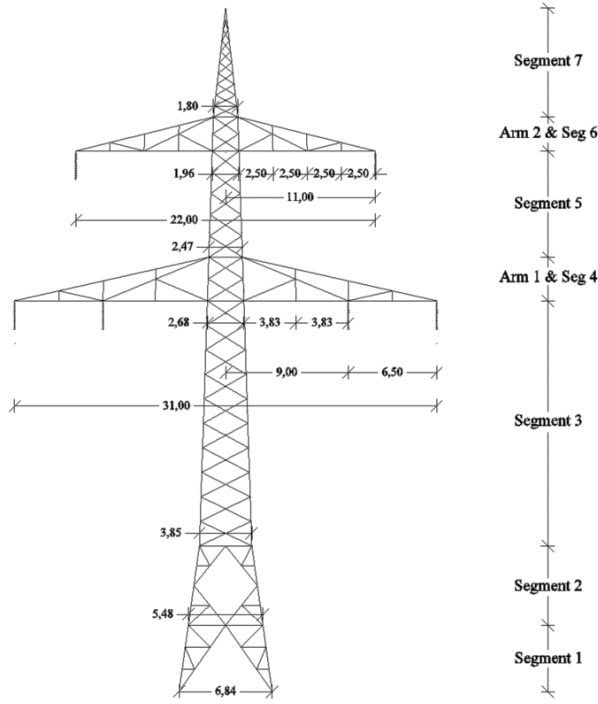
Danube tower configuration (Source: Bezas et al, 2019)
